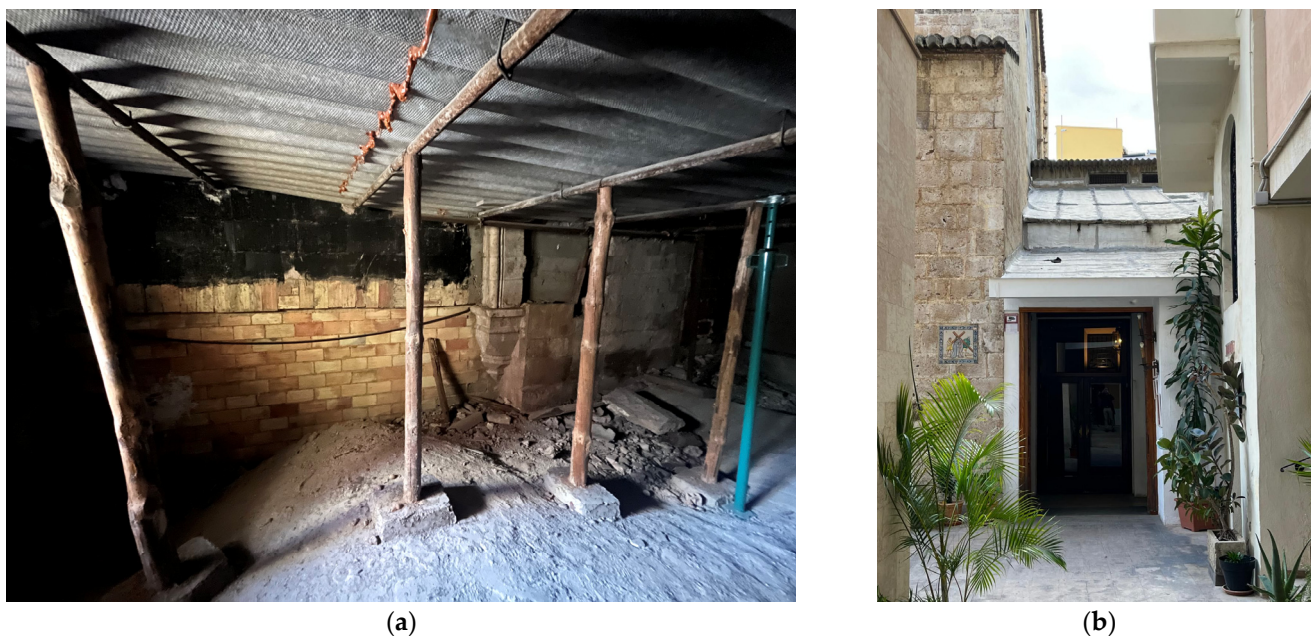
(a) View of the under-roof area prior to the 2025 intervention; (b) View of the main entrance from what was the alleyway leading to Milagro Street prior to the 2025 intervention.
